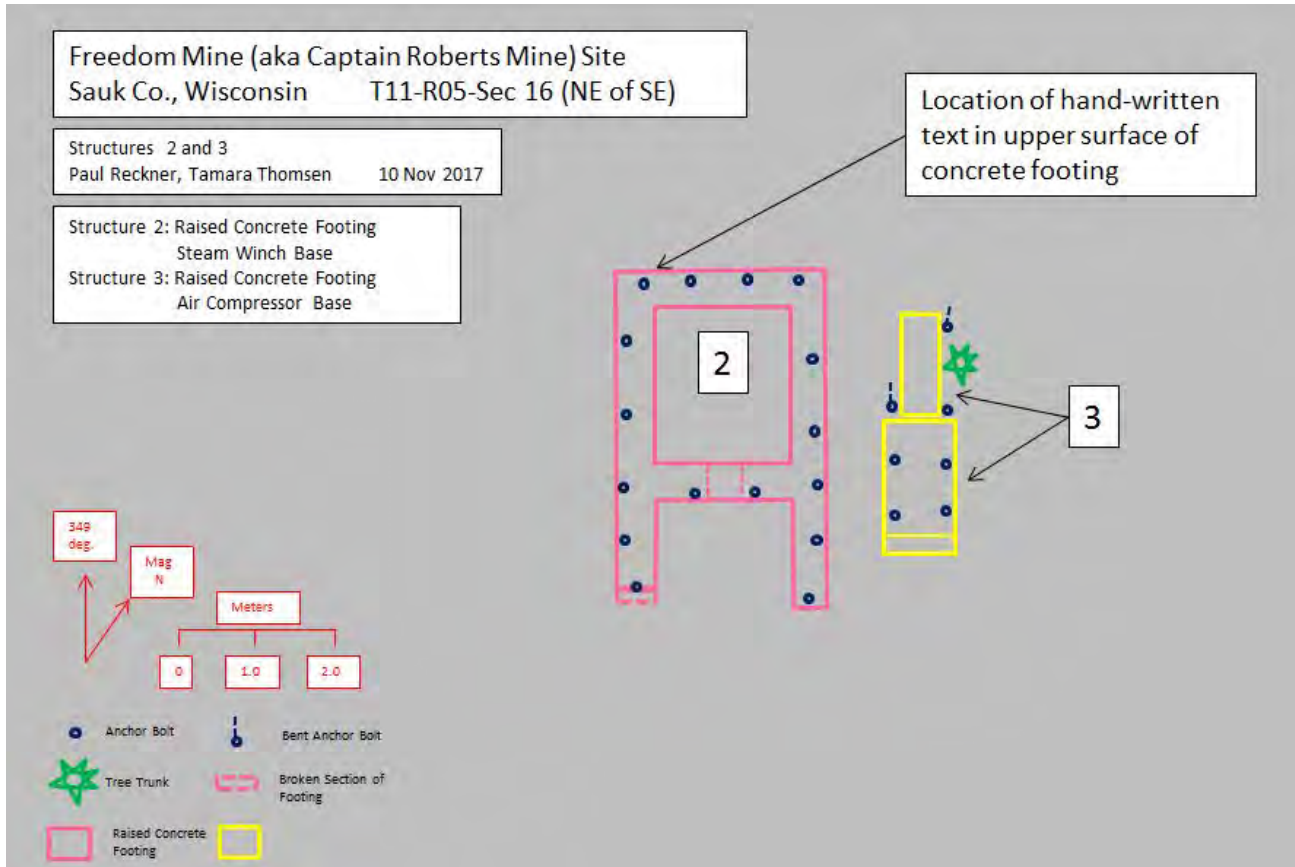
Detail of the terrestrial structures at Freedom Mine (structures 2 and 3)
